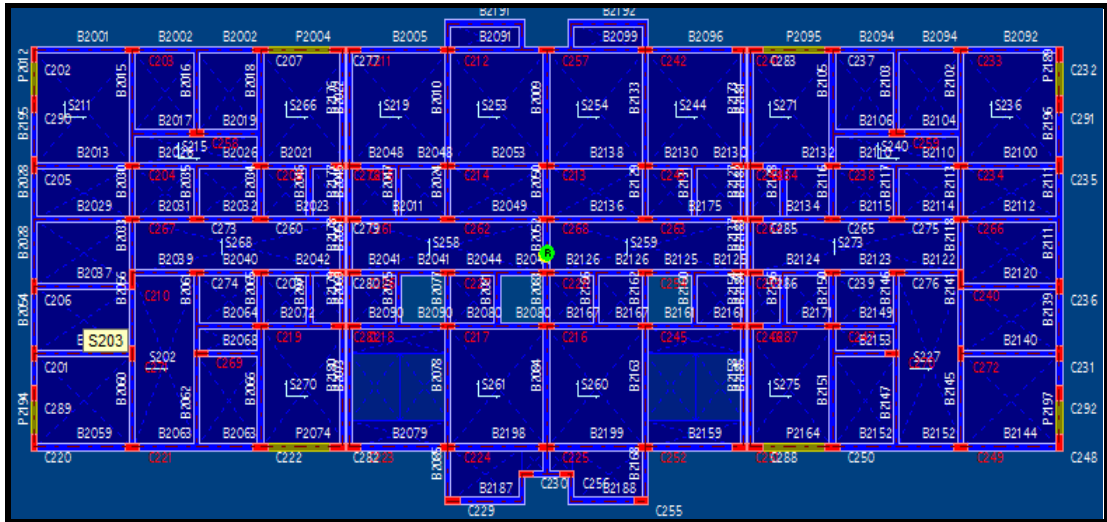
Plan of Buildings with Ten Stories and Shear Wall System
